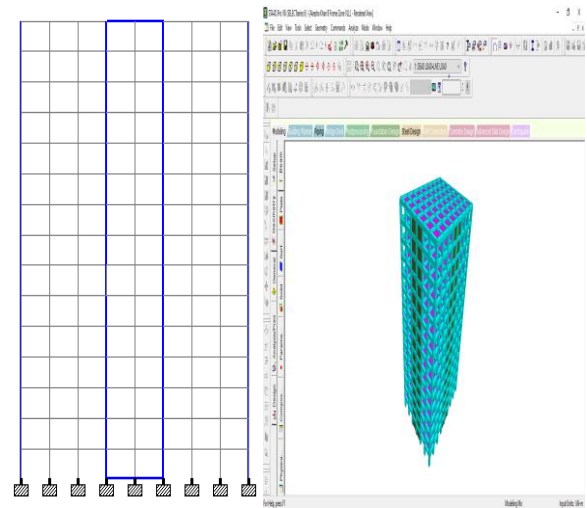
Framed building with Shear wall at the exterior side along X and Z-direction.
